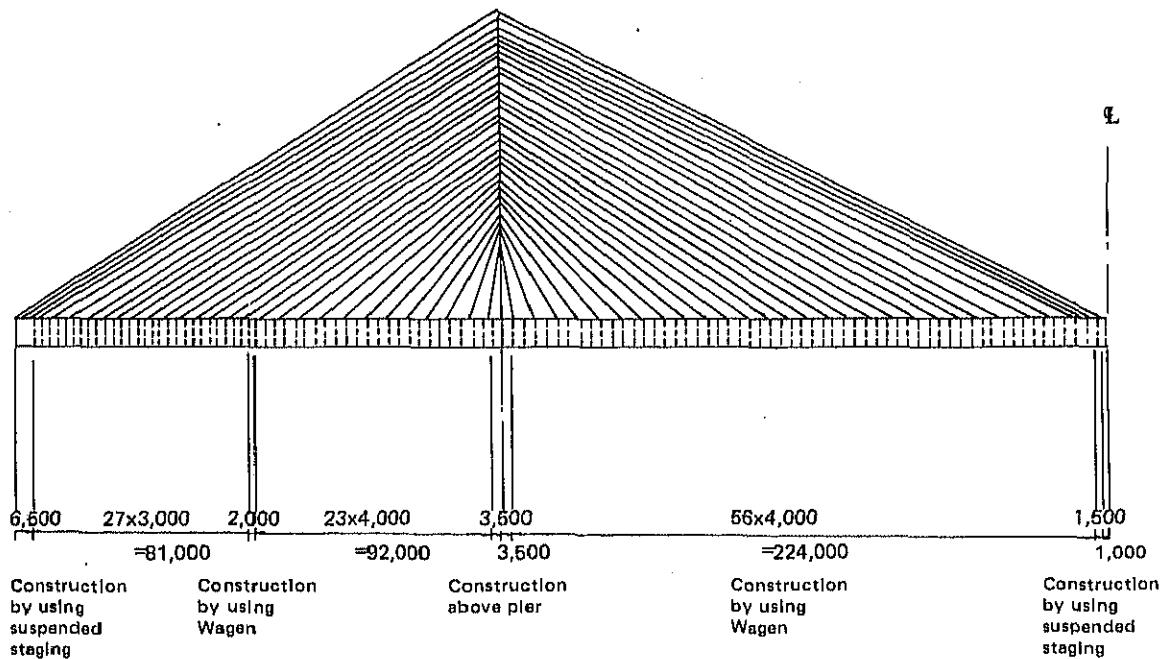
CONSTRUCTION OF MAIN GIRDER
